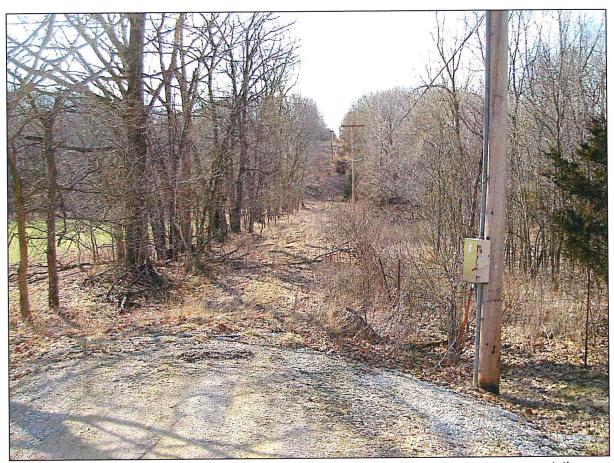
Gans Road ends and the electric lines continue - looking west at sewer pump station
